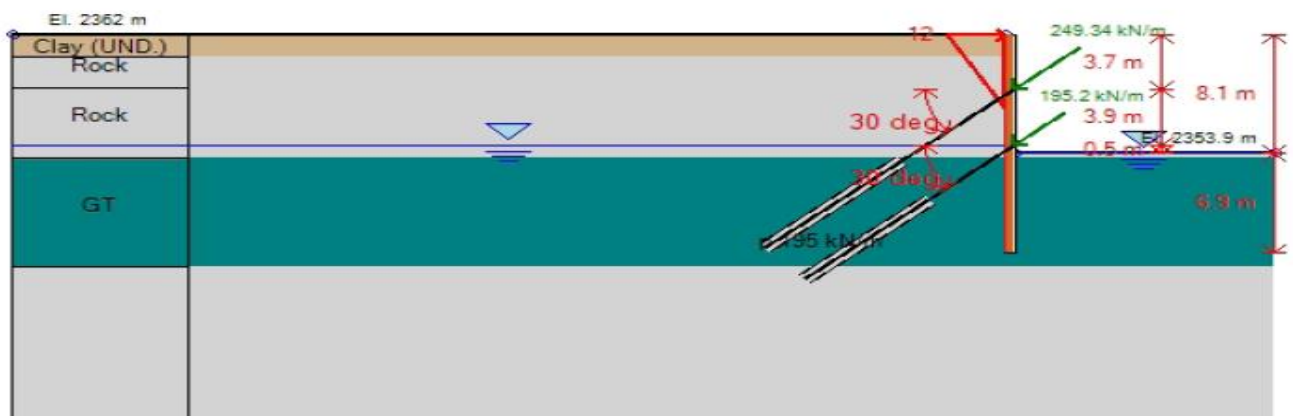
the second anchor installation for 3.7m and 1.5m pile spacing
